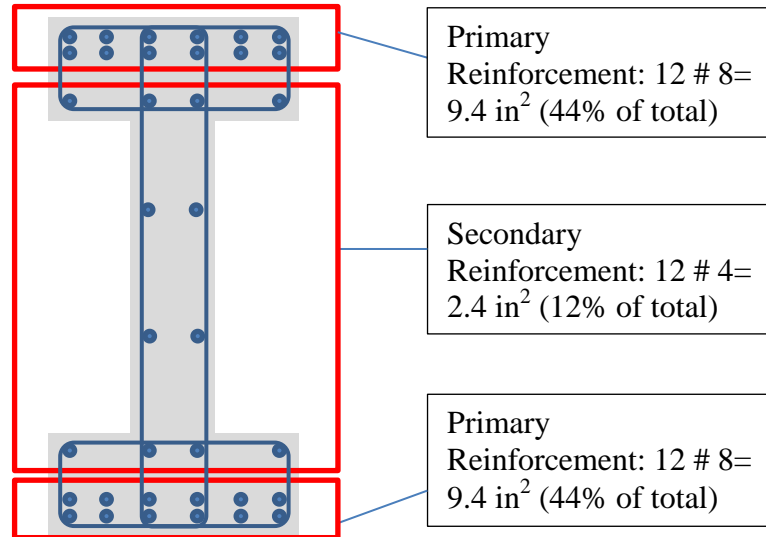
Cross Section of Typical Spandrel Beam (Two Span Condition)
